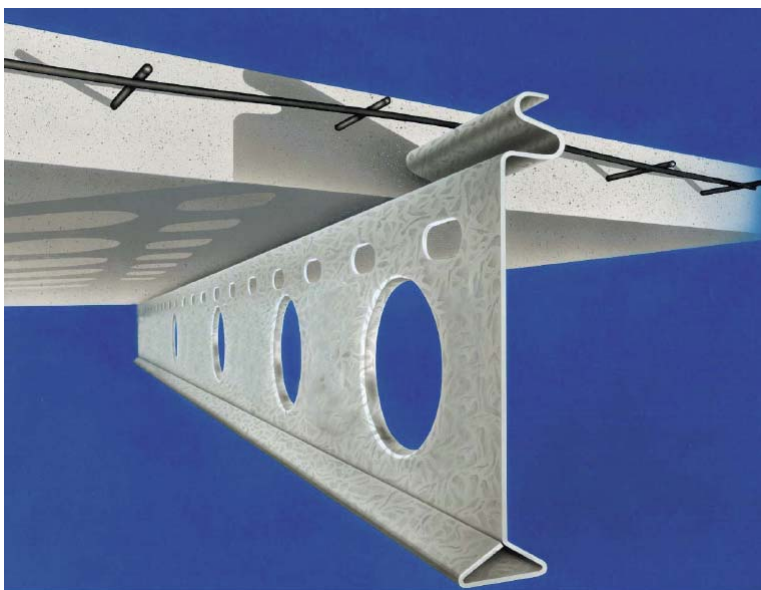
Graphic of Speedfloor Steel Joist System
